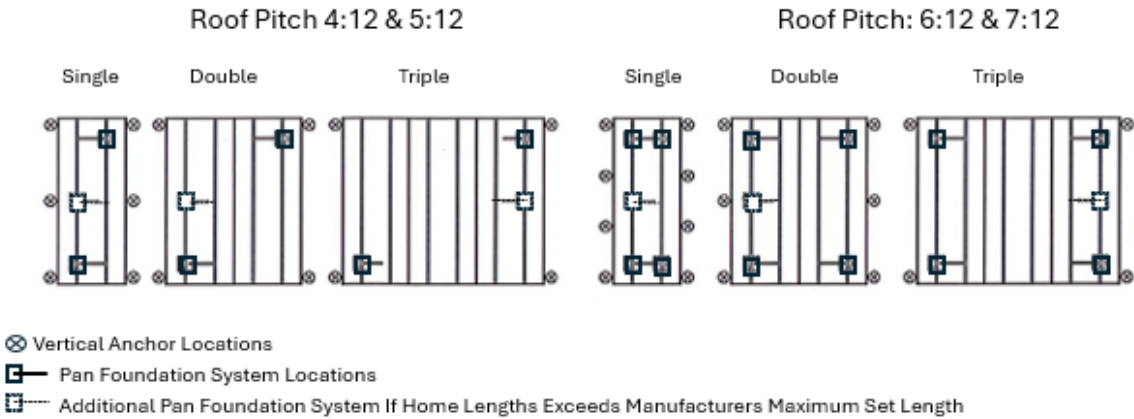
Anchor and Pan Foundation System Installation Locations for Varying Roof Pitch
